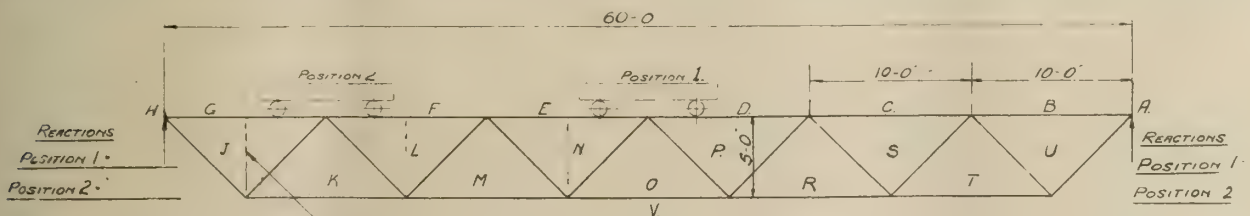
DESIGN AND EQUIPMENT OF CRANES
